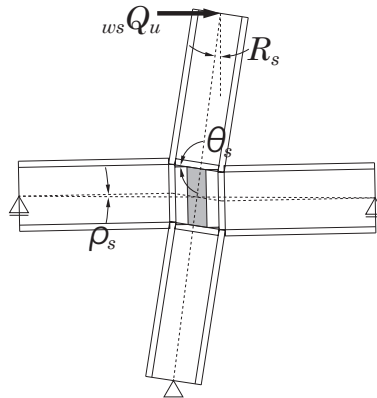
Fracture Mechanism 2 Set Based on 4-point Bending Test Results (damage to front fillet weld)
